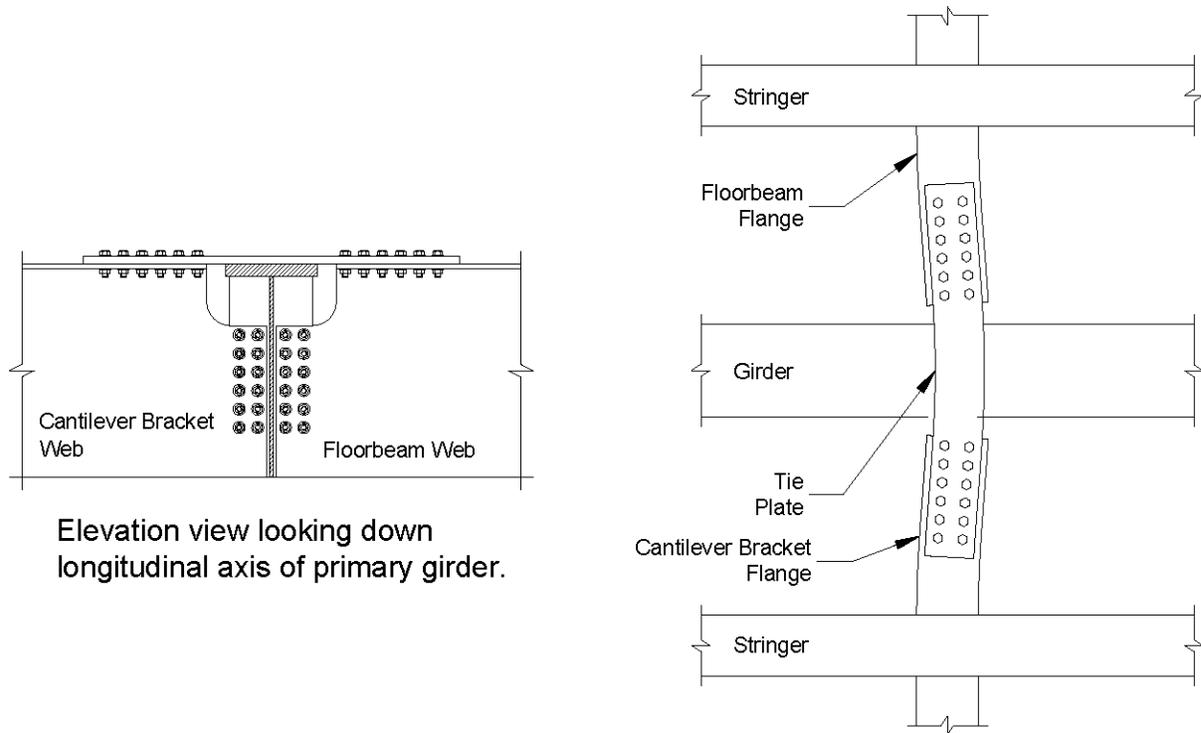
Zoomed-in view of tie plate detail (left) and deformation mode that causes cracking (right).
